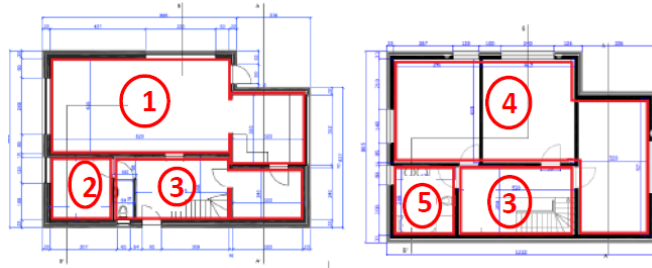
Division of the detached (D) dwellings into zones: first (left) and second (right) floors [8].
